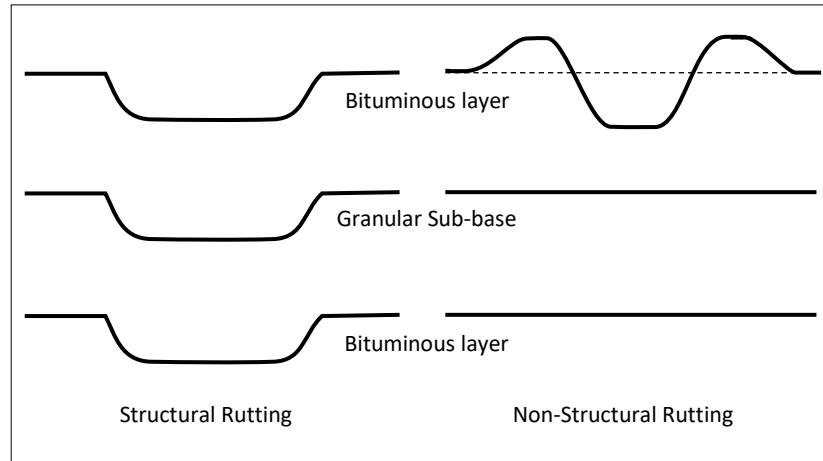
Structural and Non-Structural Rutting (Gibb 1996)
